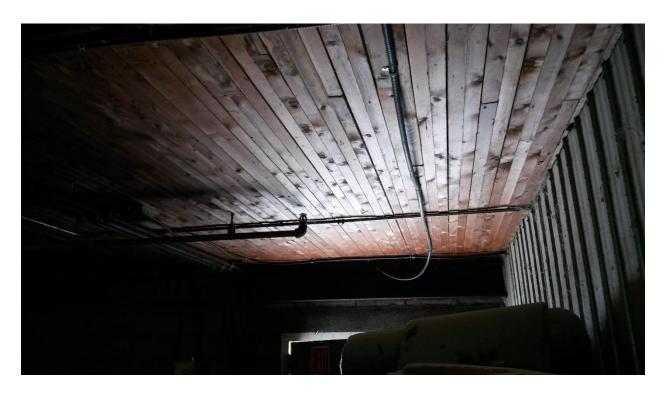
Sawmill interior – roof of lower level/upper level floor (wood).
